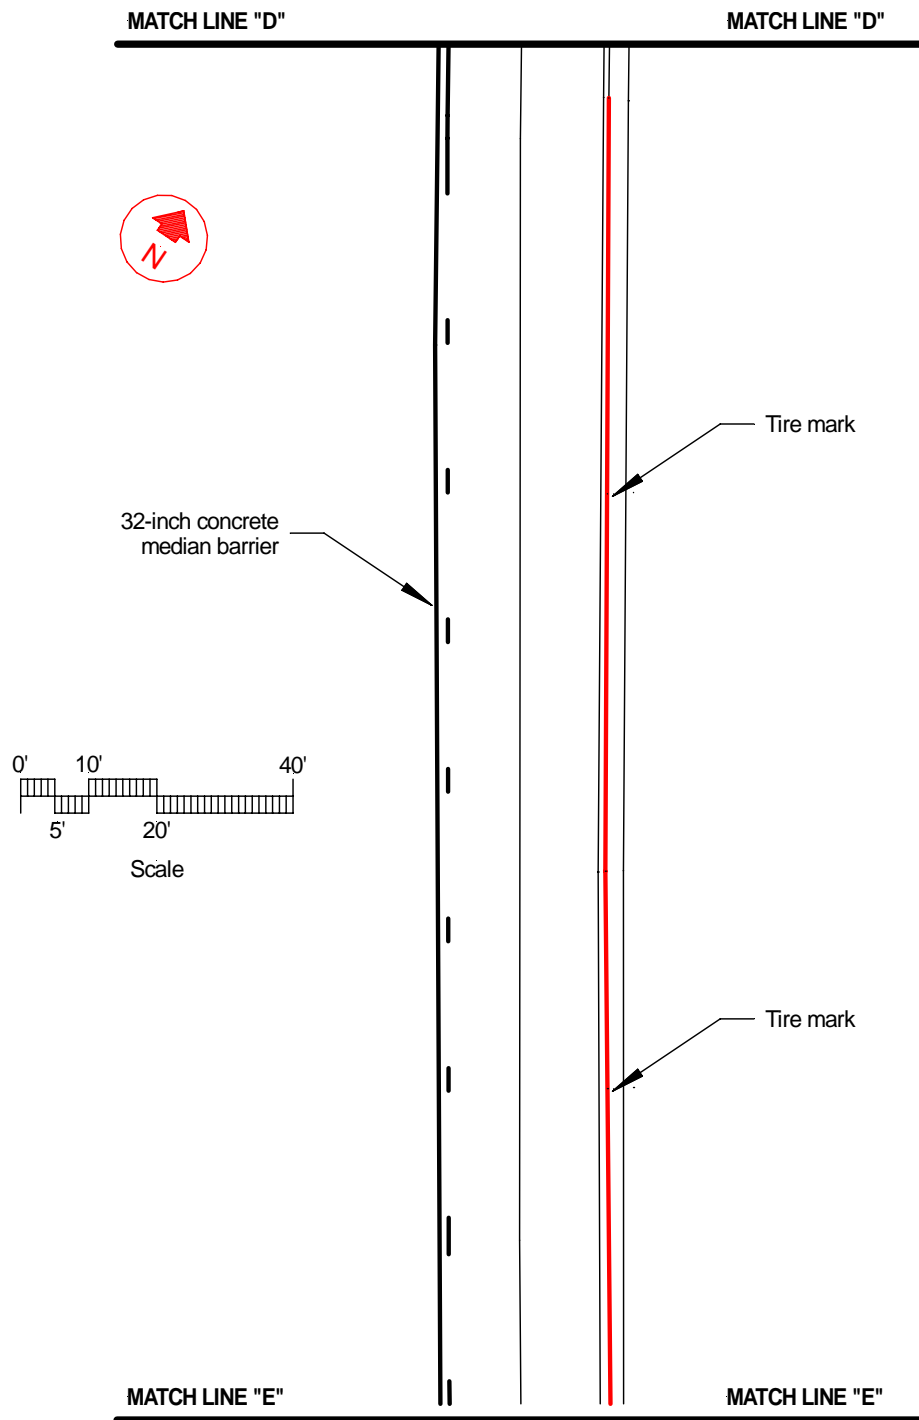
NTSB map of D-E pavement markings and roadway evidence.
